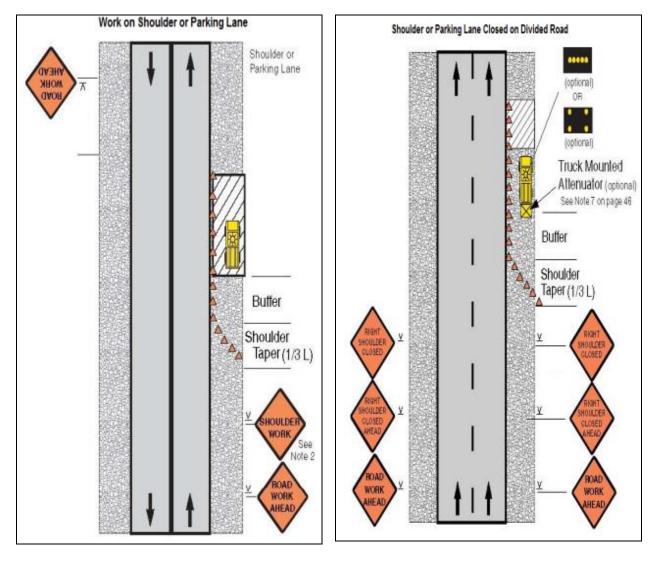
& A4.3: Work on shoulder or parking lane and shoulder or parking lane closed on divided road
